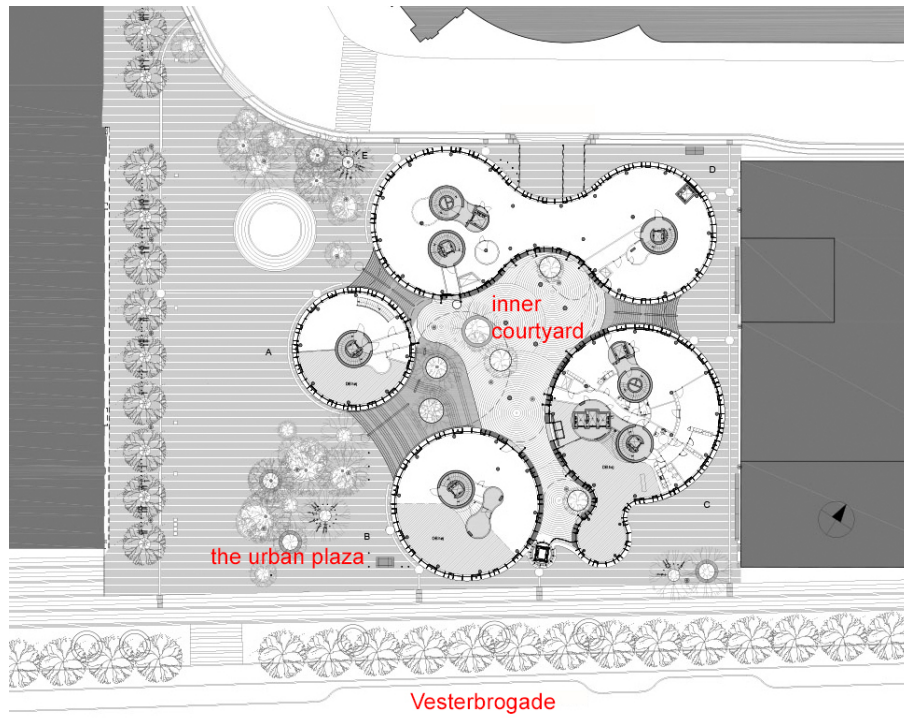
Axel Towers. 1st floor plan [drawing by Lundgaard & Tranberg Architects; found at (Stoughton, 2018)].
